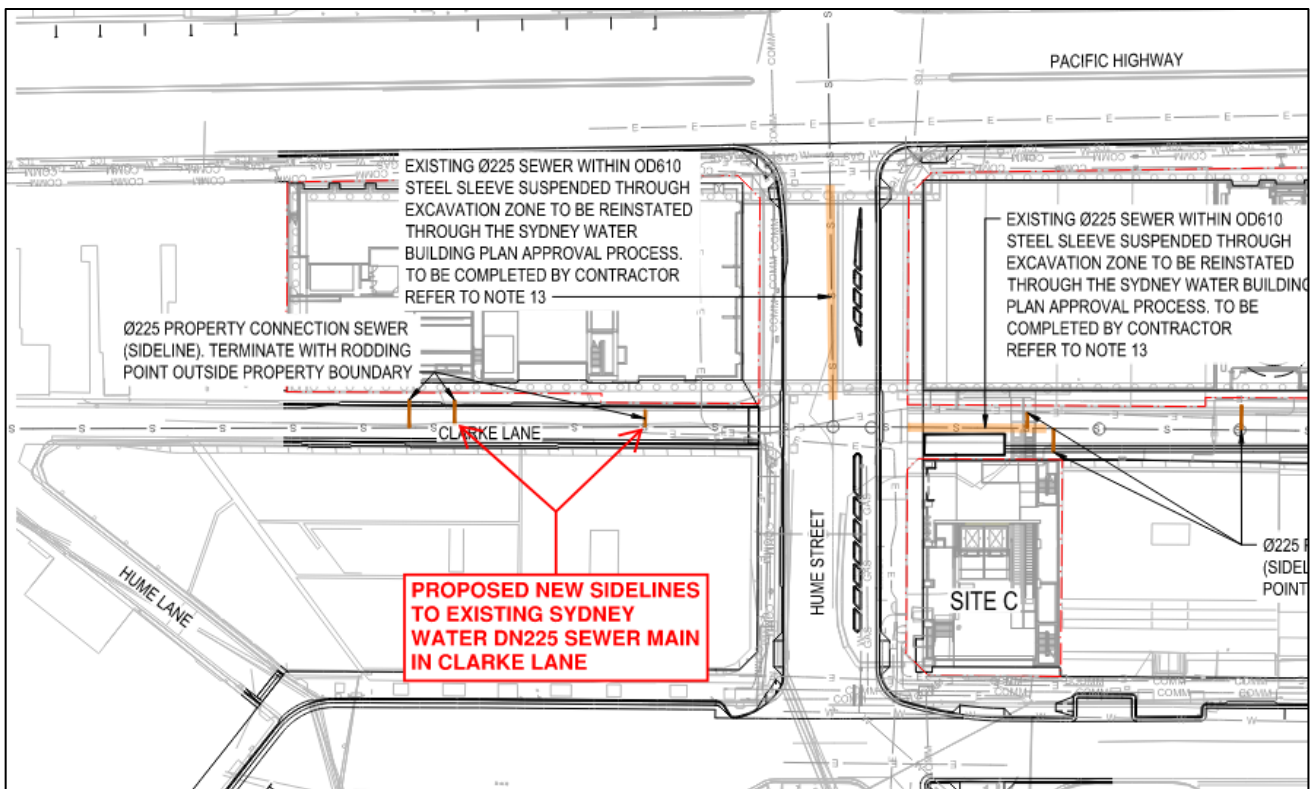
Sydney Metro Crows Nest – Proposed Utilities Plan – showing proposed new DN225 Sydney Water sewer sidelines
